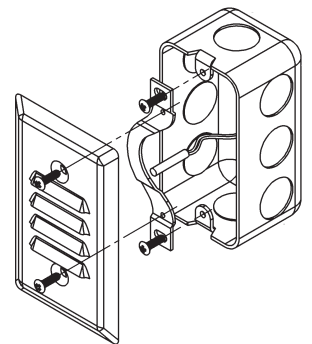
Remote Sensor Shown Installed in an Junction Box with a Wall Plate Cover
